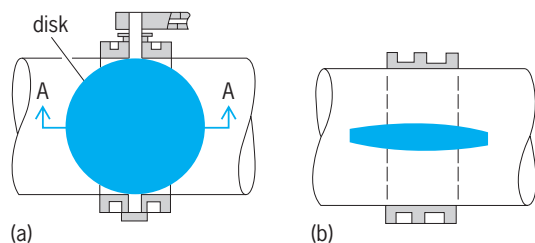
Butterfly-type valve for penstock is typically 25 ft (7.6 m) in diameter. (a) Elevation. (b) Section A-A.
